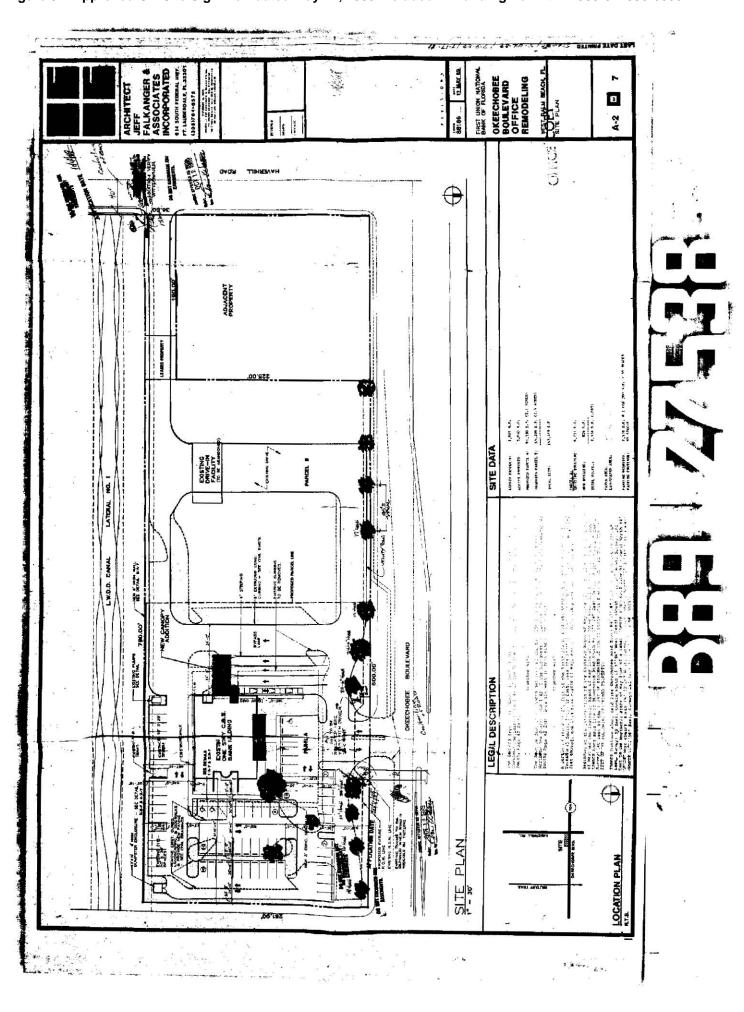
Approved Off-Site Sign Plan dated May 17, 1989 included in Building Permit B-1989-027538-0000
